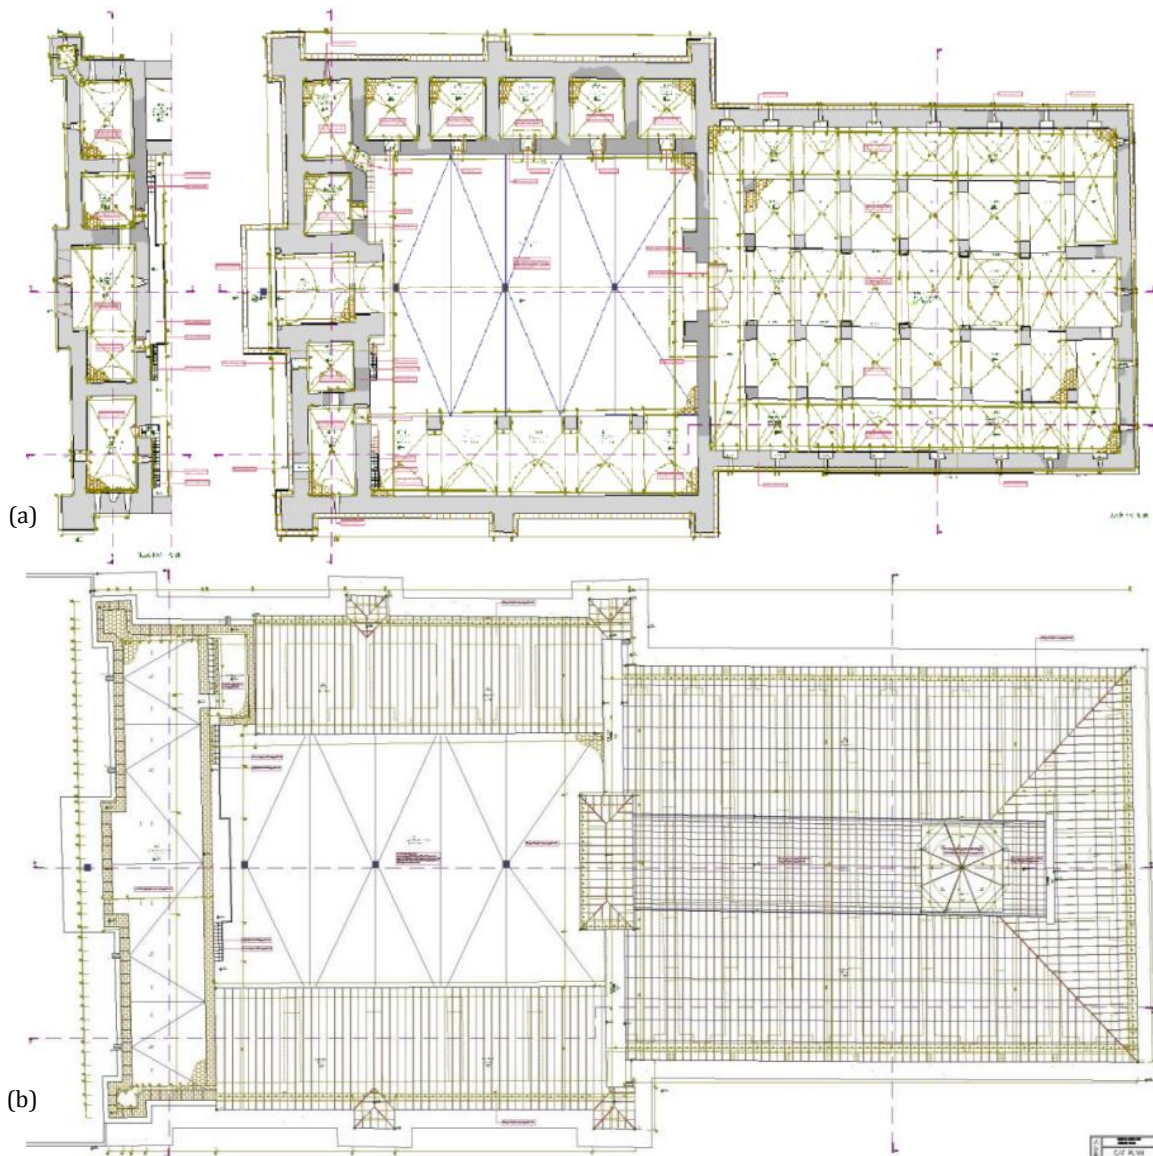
Historical Obruk Inn: (a) Ground floor plan, (b) Roof floor plan.
